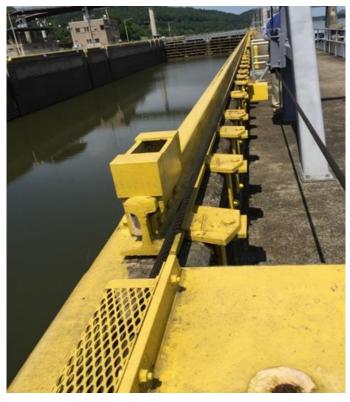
Murray Lock – rail located at top of the parapet wall
